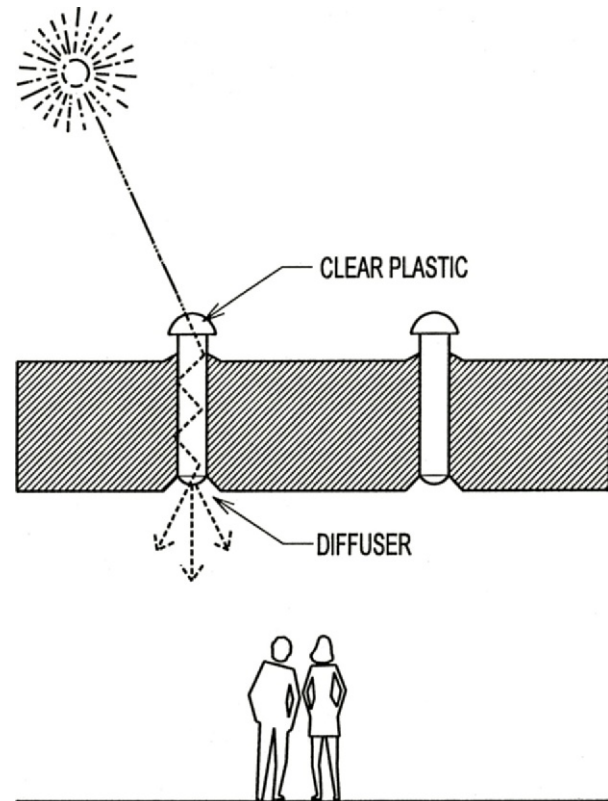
Tubular light shafts are most appropriate for bringing daylight into the interior areas of existing buildings. When used in new construction, the lower opening should be splayed as much as possible.
